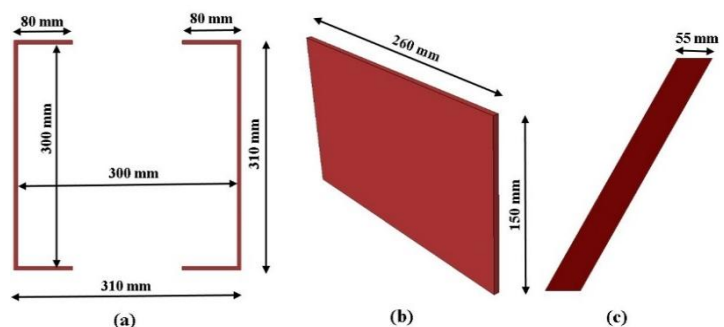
(a) Details of the two C-channels steel jacket; (b) The connecting batten plate; (c) The connecting lattice plate.
